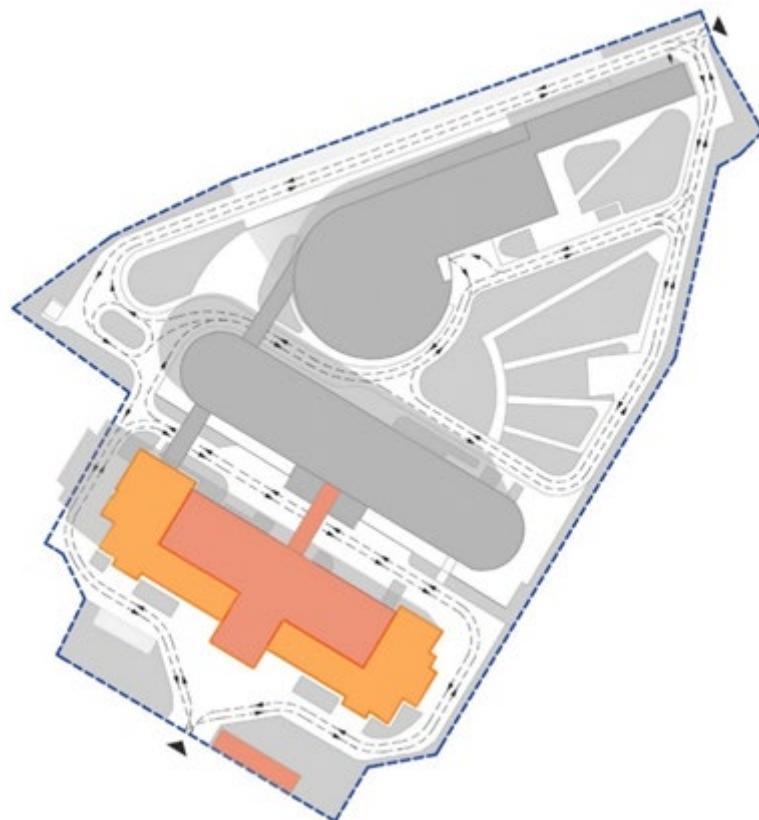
Plan for the reconstruction of the MHF building by insertion and extension.
